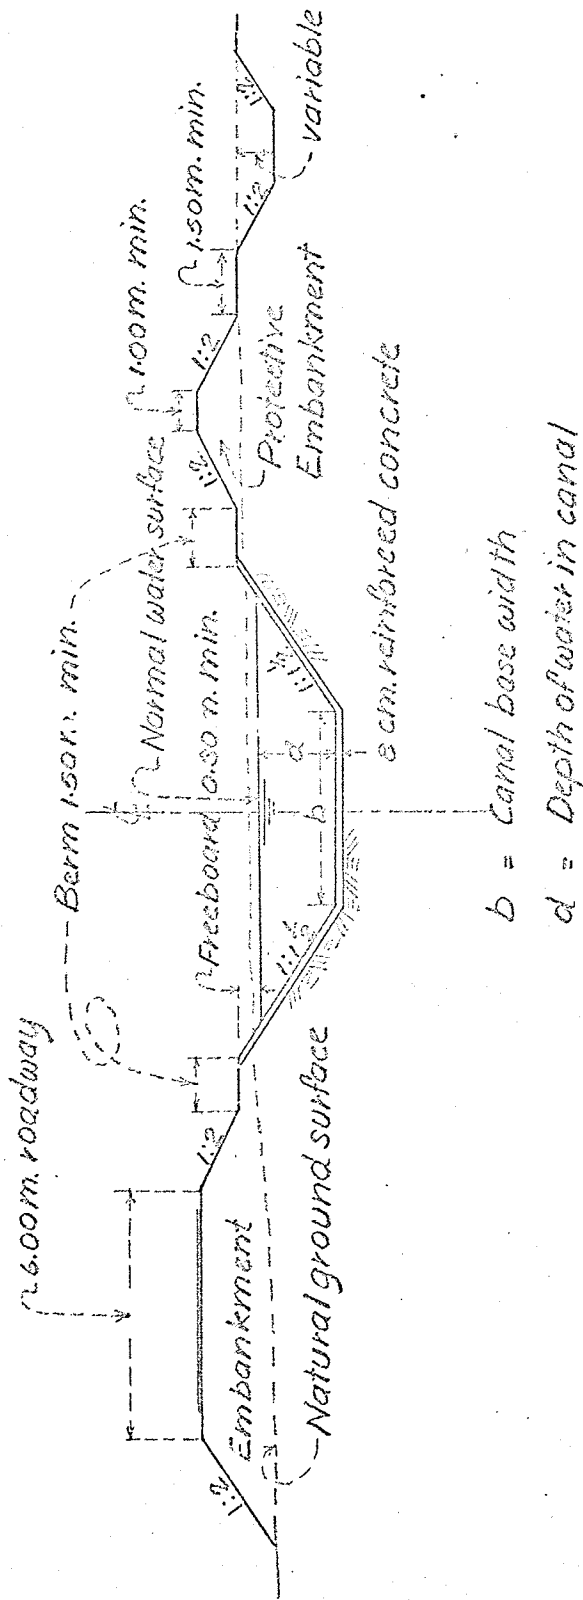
TYPICAL CROSS SECTION OF CANAL
